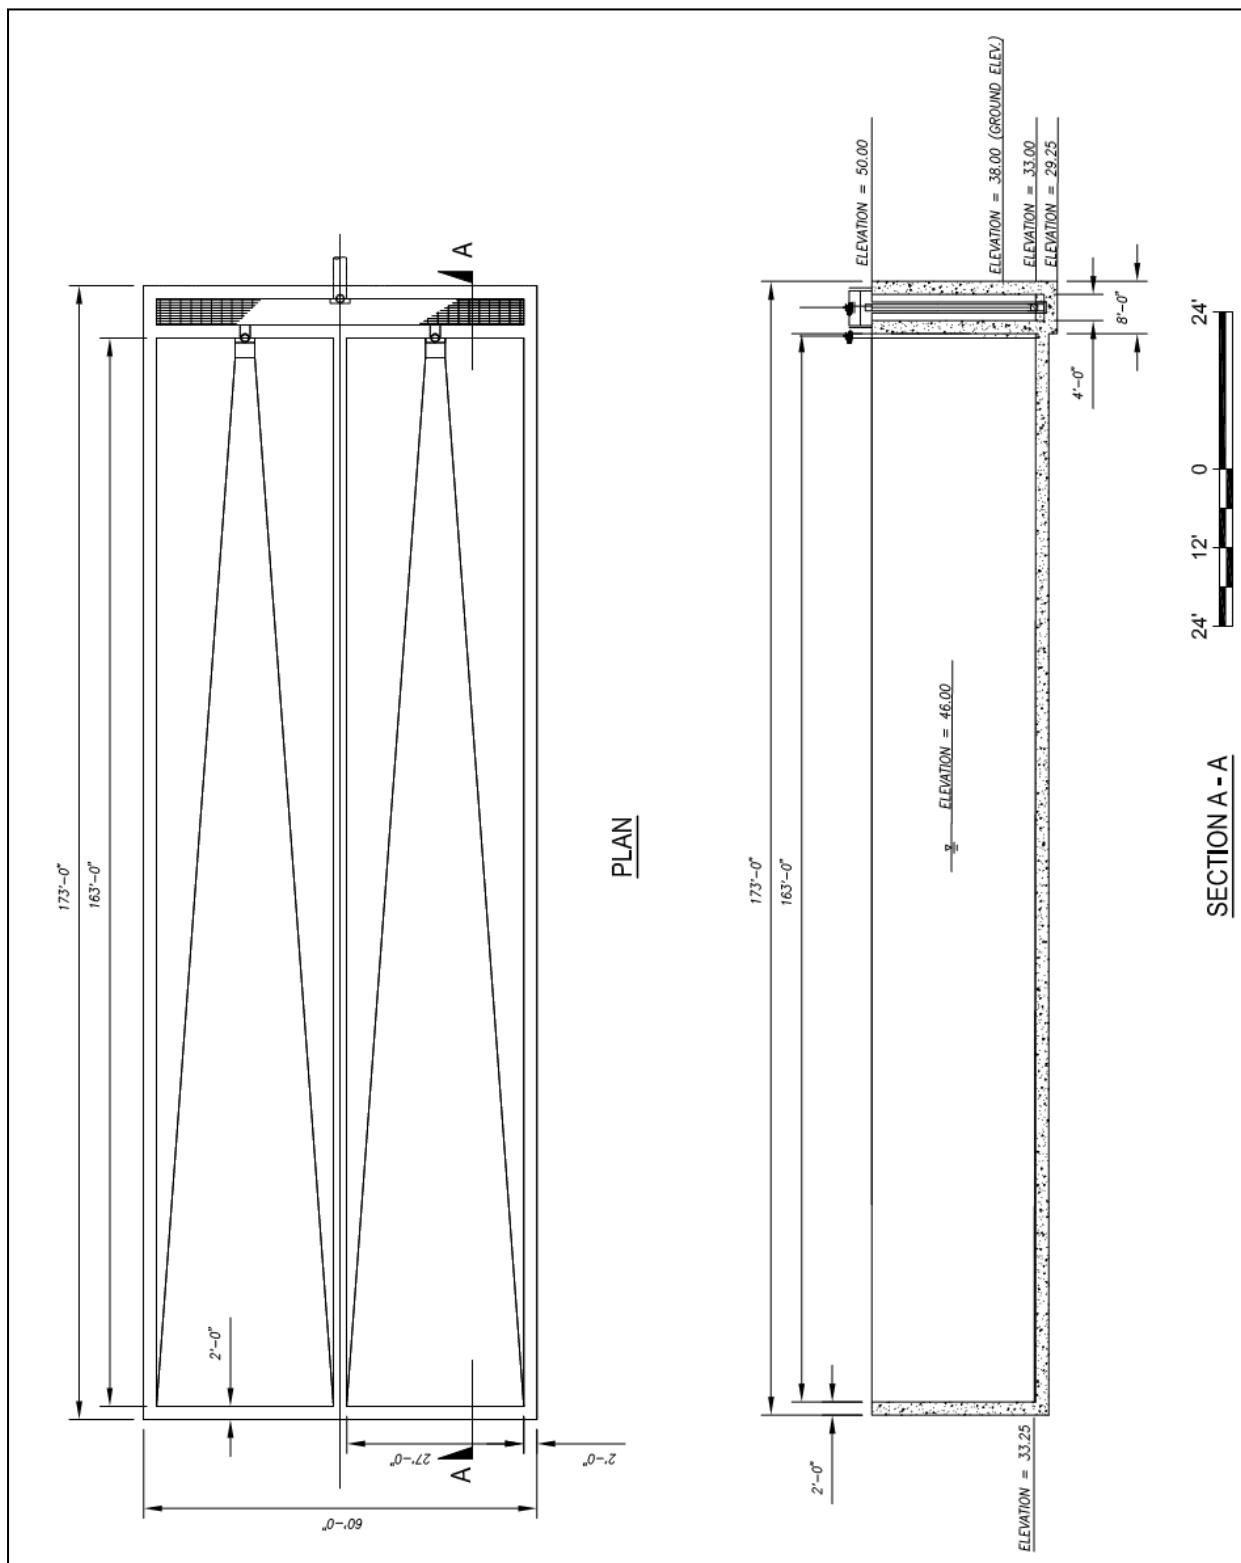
Option 3A: Plan and Section Views - 0.84 MG EQ Basin at Effluent Holding Pond
